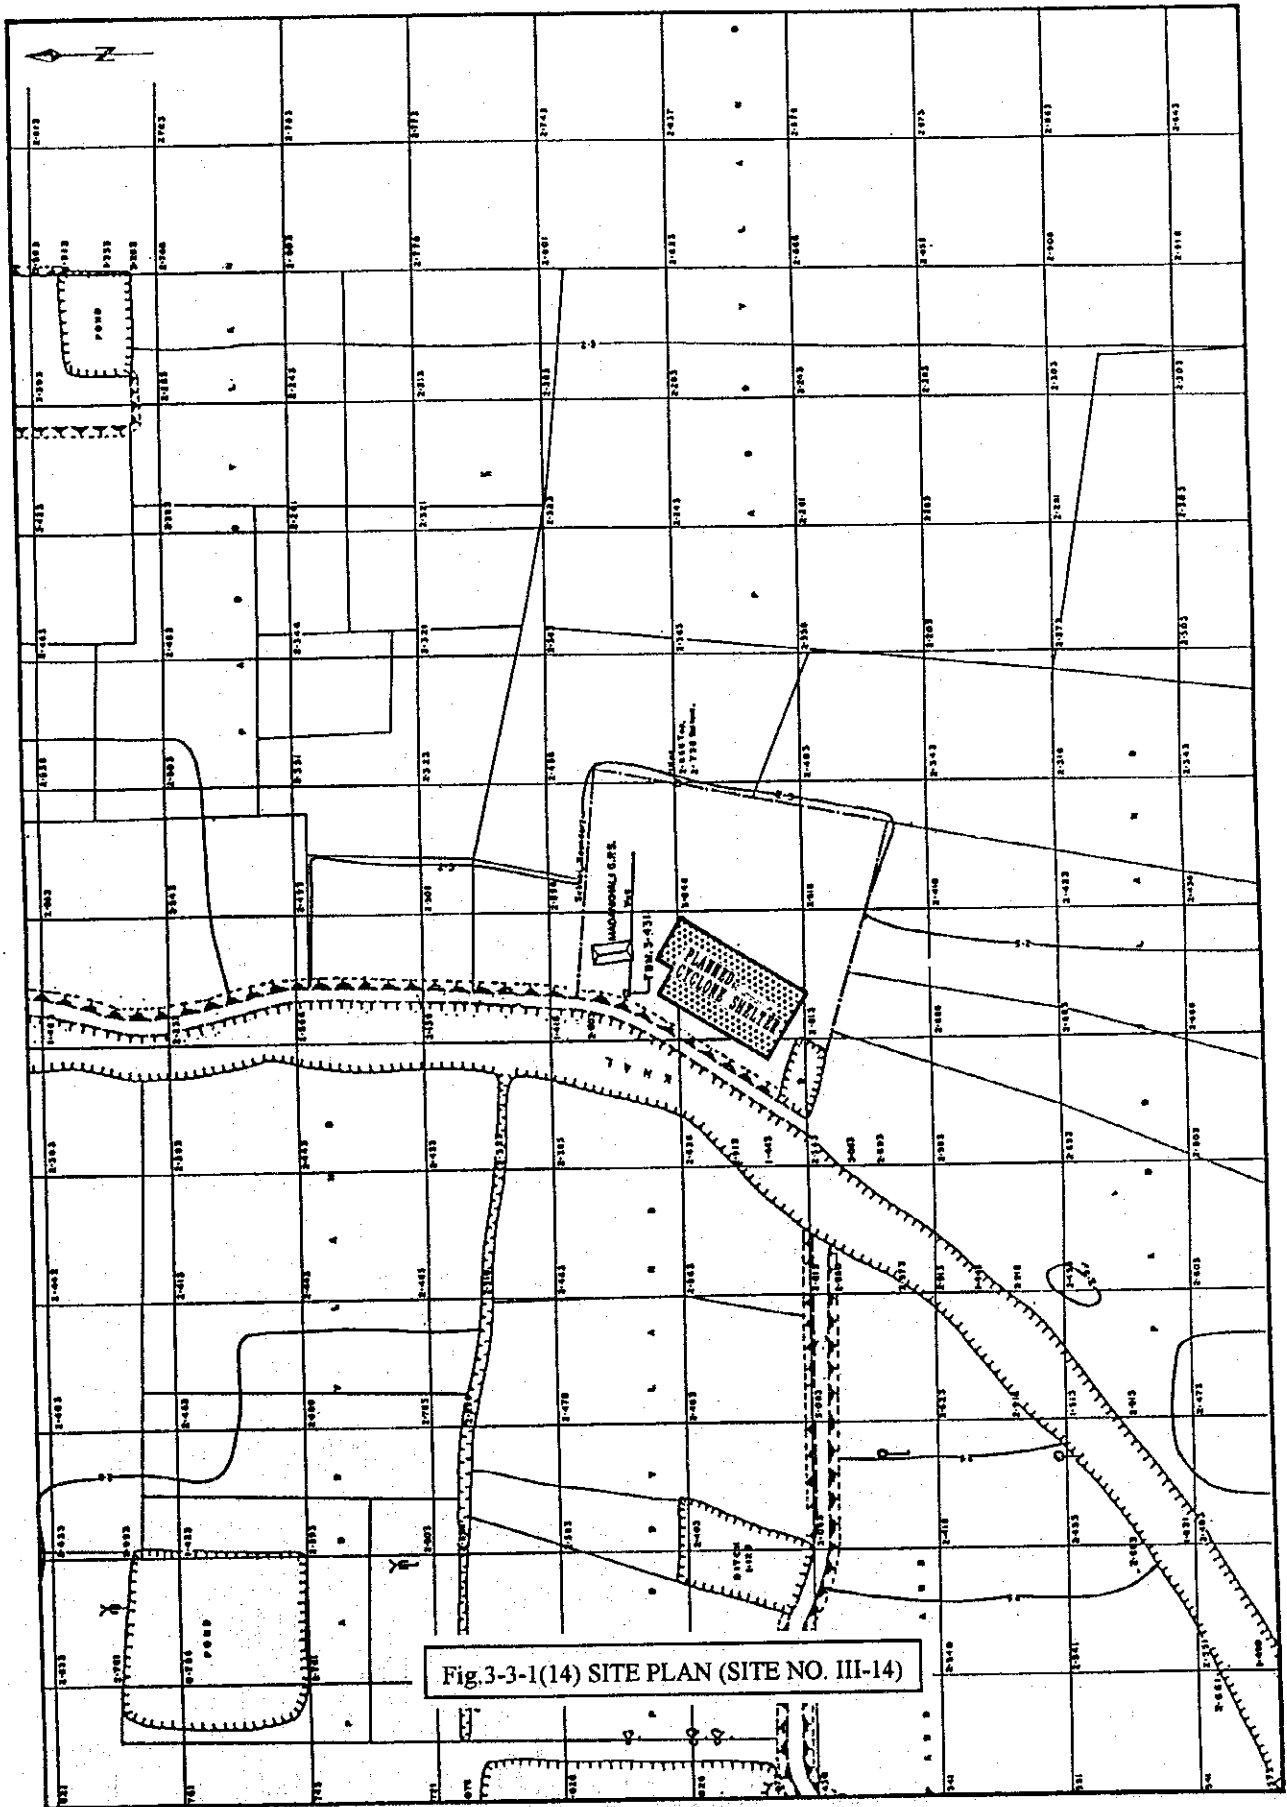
(14) SITE PLAN (SITE NO. III-14)
